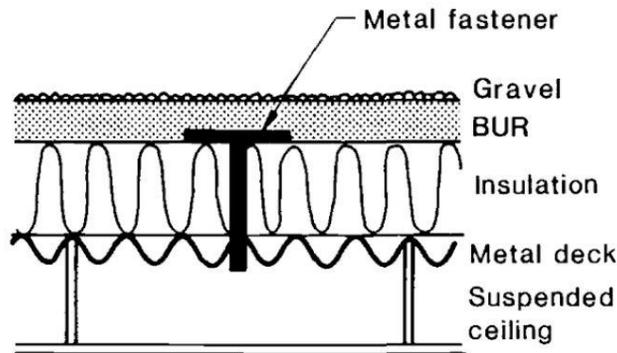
Construction details for a metal-deck roof with metal fasteners.
